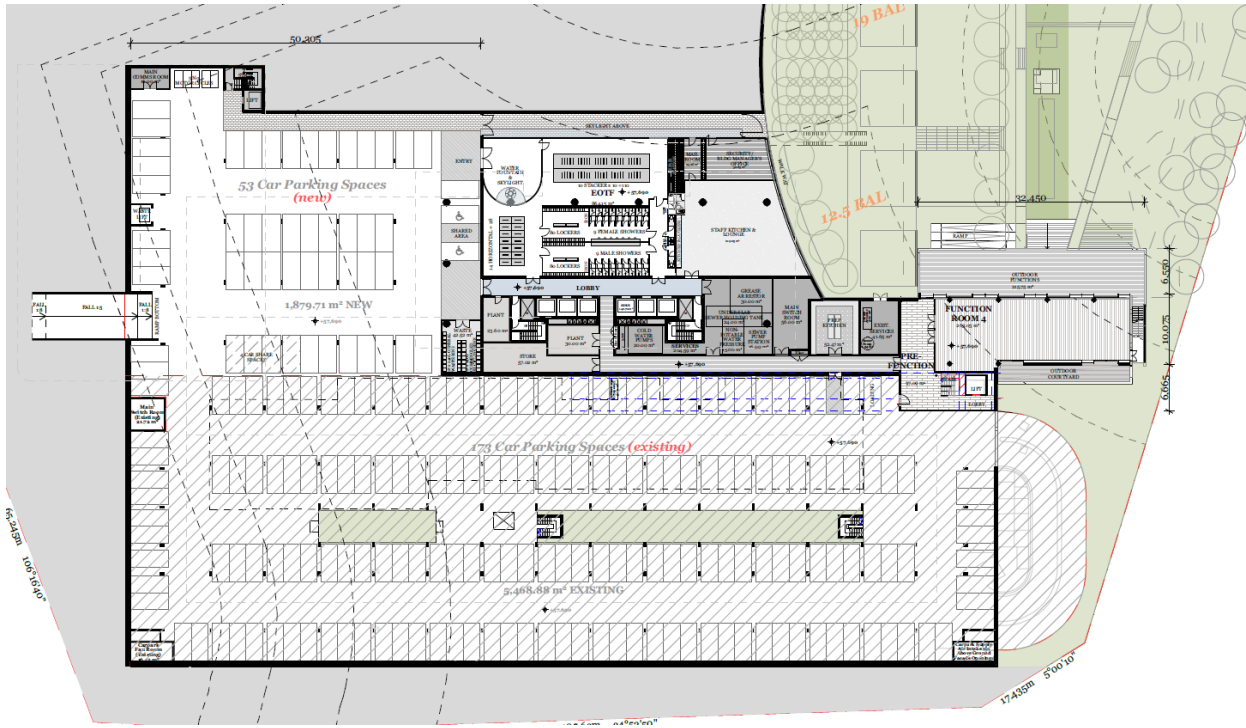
Extract of the basement and garden plan (Source: DKO Architecture)
